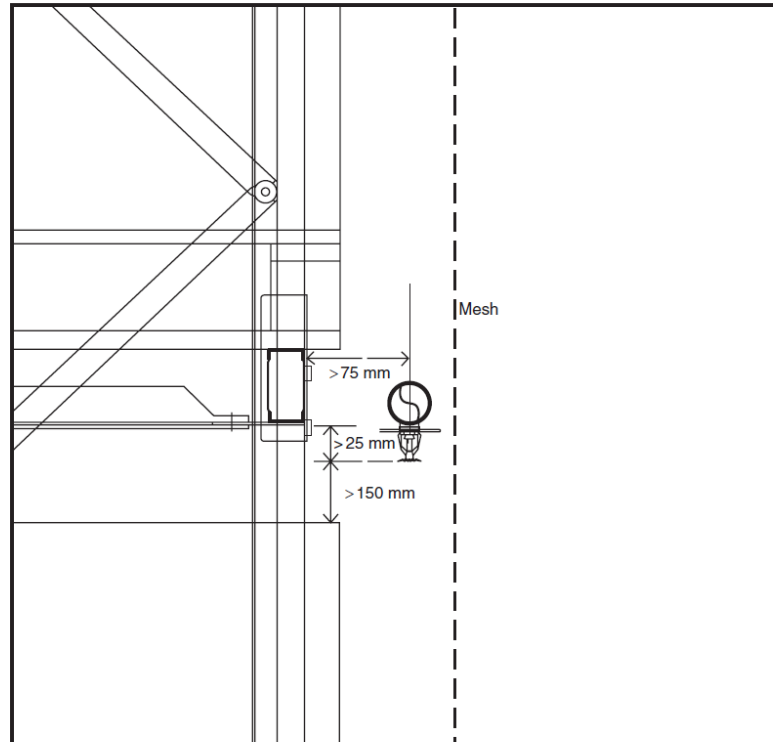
F8 shows an end elevation detail. Sprinkler heads shall be sited at the rear face (away from normal loading side) of a single row rack. The head shall be at least 75mm away from the rack upright support. Where mesh is used, the head shall be sited inside the mesh. The minimum distance between a sprinkler head deflector and the underside of horizontal support for the level above shall be 25mm. There shall be a clear space above stored goods of at least 150mm to the sprinkler deflector.
